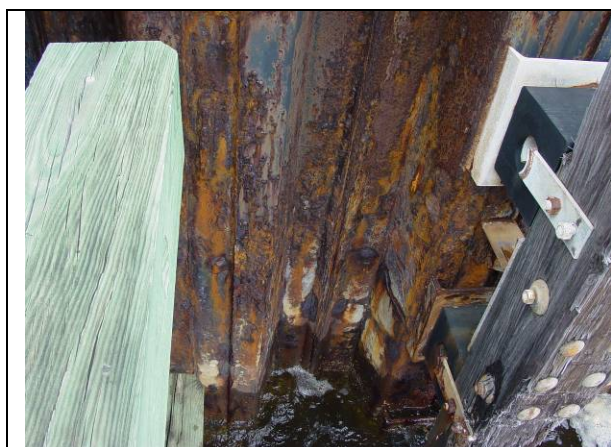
Typical corrosion on Pensacola steel sheet pile before surface preparation.
